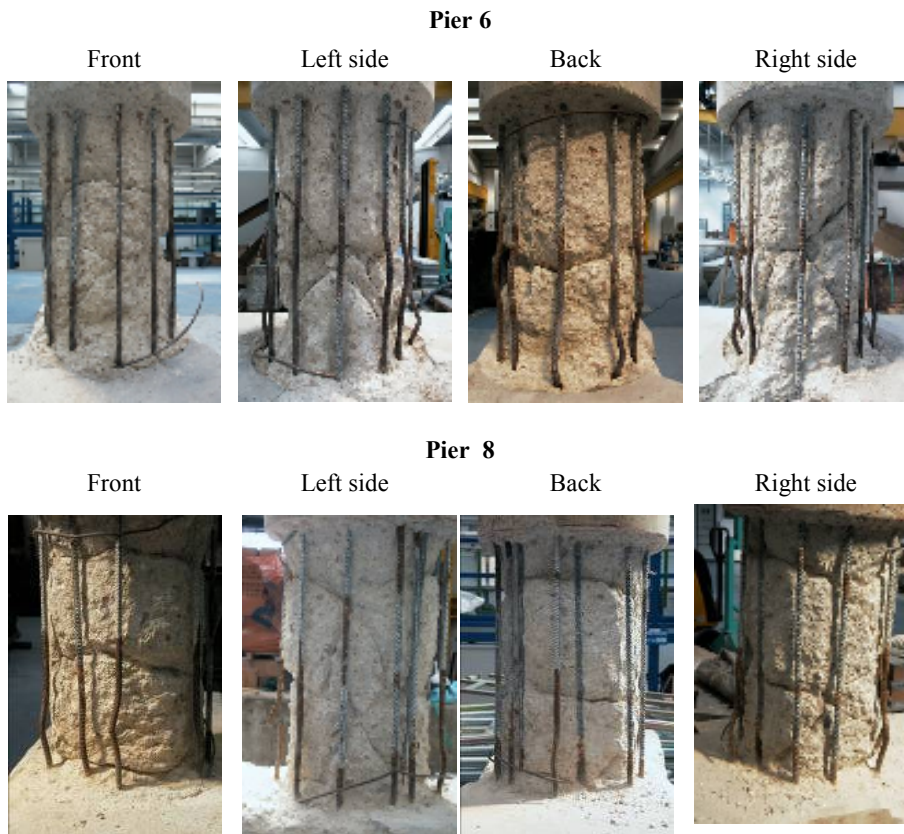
Damaged concrete core removal and crack cleaning (phase 1)
